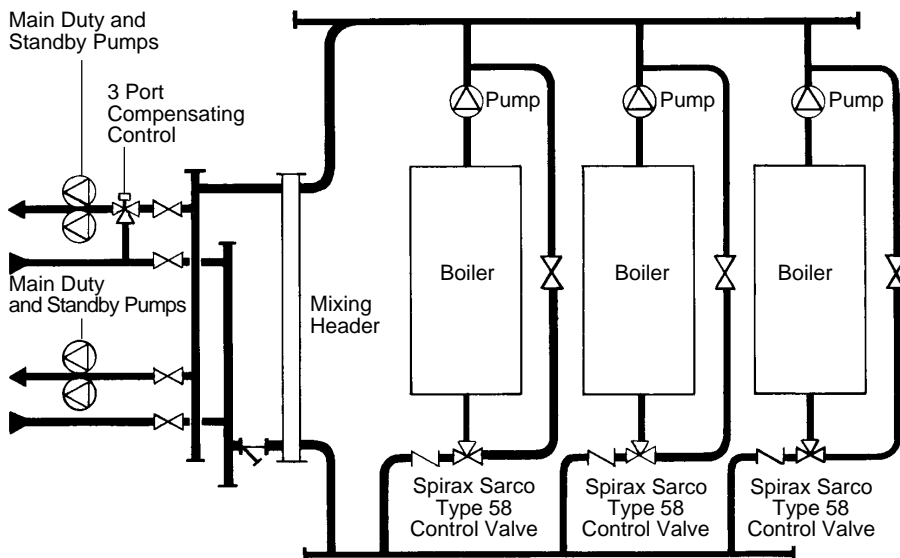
Multiboiler Installation with Separate Type 58 on each Boiler
